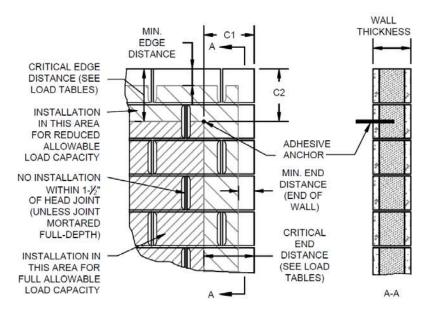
ILLUSTRATION OF AC100+ GOLD ADHESIVE ANCHORS INSTALLED INTO GROUTED CONCRETE MASONRY WALL
